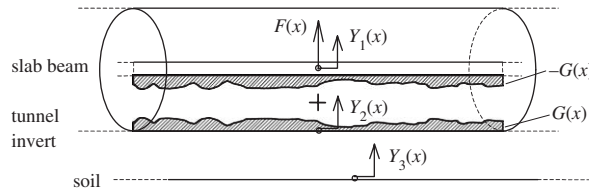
Joining a simple slab beam of infinite length to the tunnel, showing the equal and opposite interaction forces acting on the beam and the tunnel.
